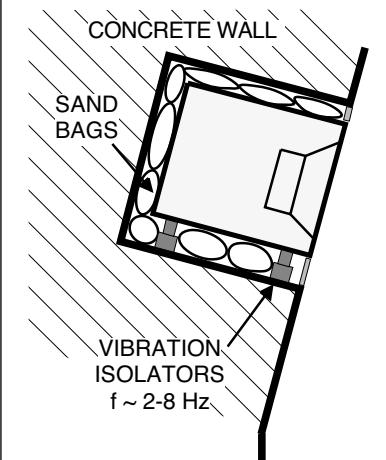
Flush mounting the speaker in a wall constructed of concrete
